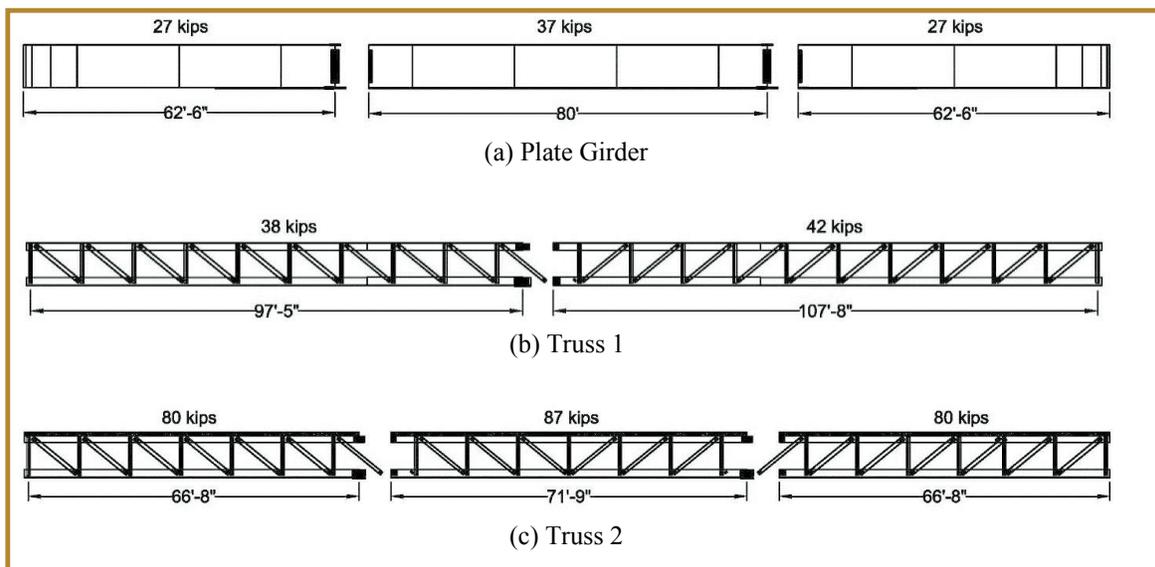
Weight of each Splice Section for the (a) Plate Girder, (b) Truss 1 and (c) Truss 2
